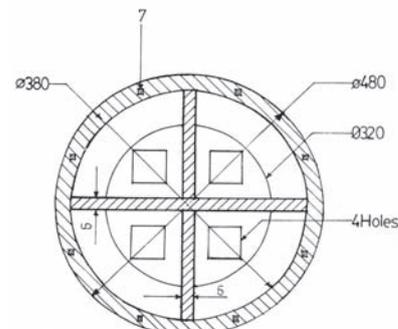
Plan view of the reinforced mud silo (Section A-A)
